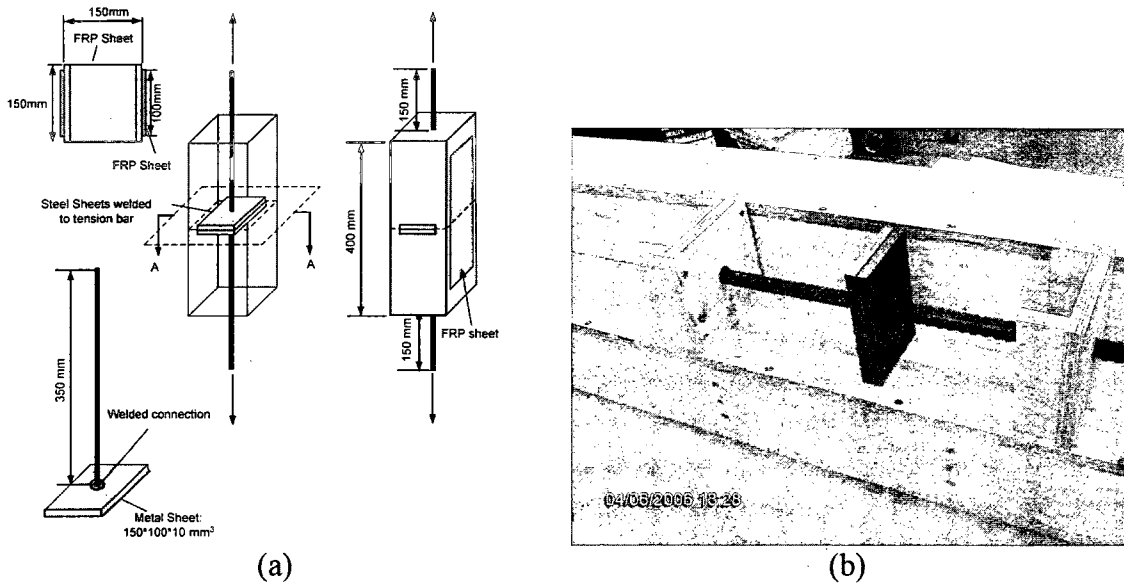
Steel plates used to apply load (a) Schematic view; (b) Actual re-bar plate assembly in formwork
